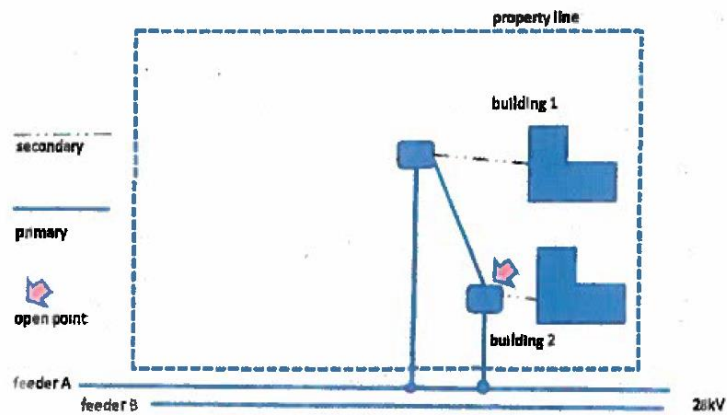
2 BUILDING CONNECTION greater than 1,000kVA
